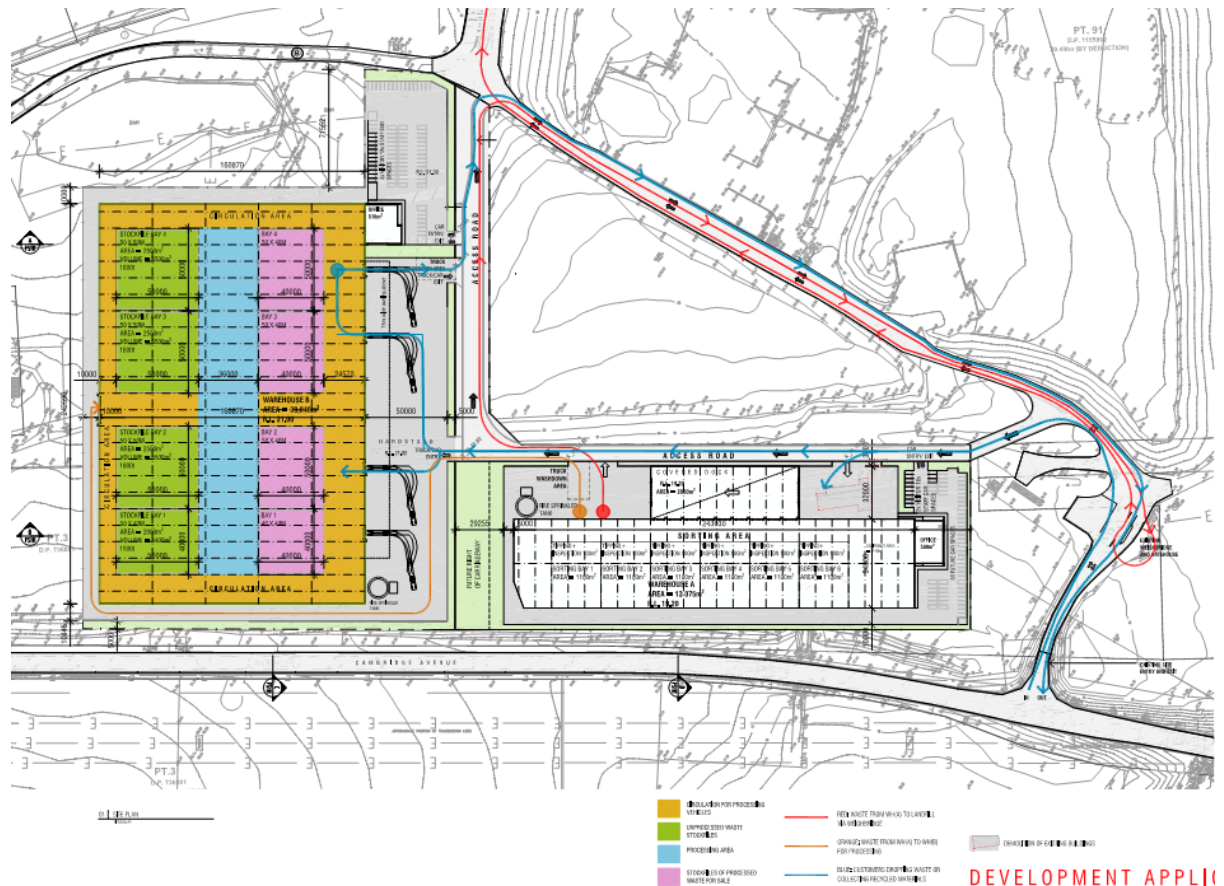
Detailed Site Plan (Source: L Form Architects, 2022)
